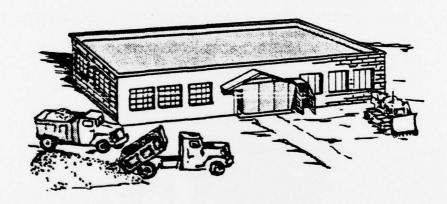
ILLUSTRATION OF BOARDED OPENINGS.
